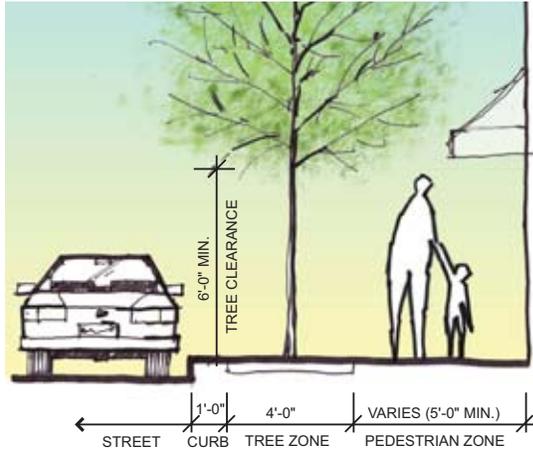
elevation of typical sidewalk with street tree and tree grate
